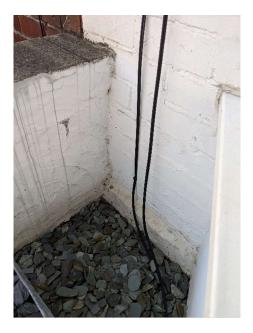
The LHS front boundary wall abuts the front elevation.
